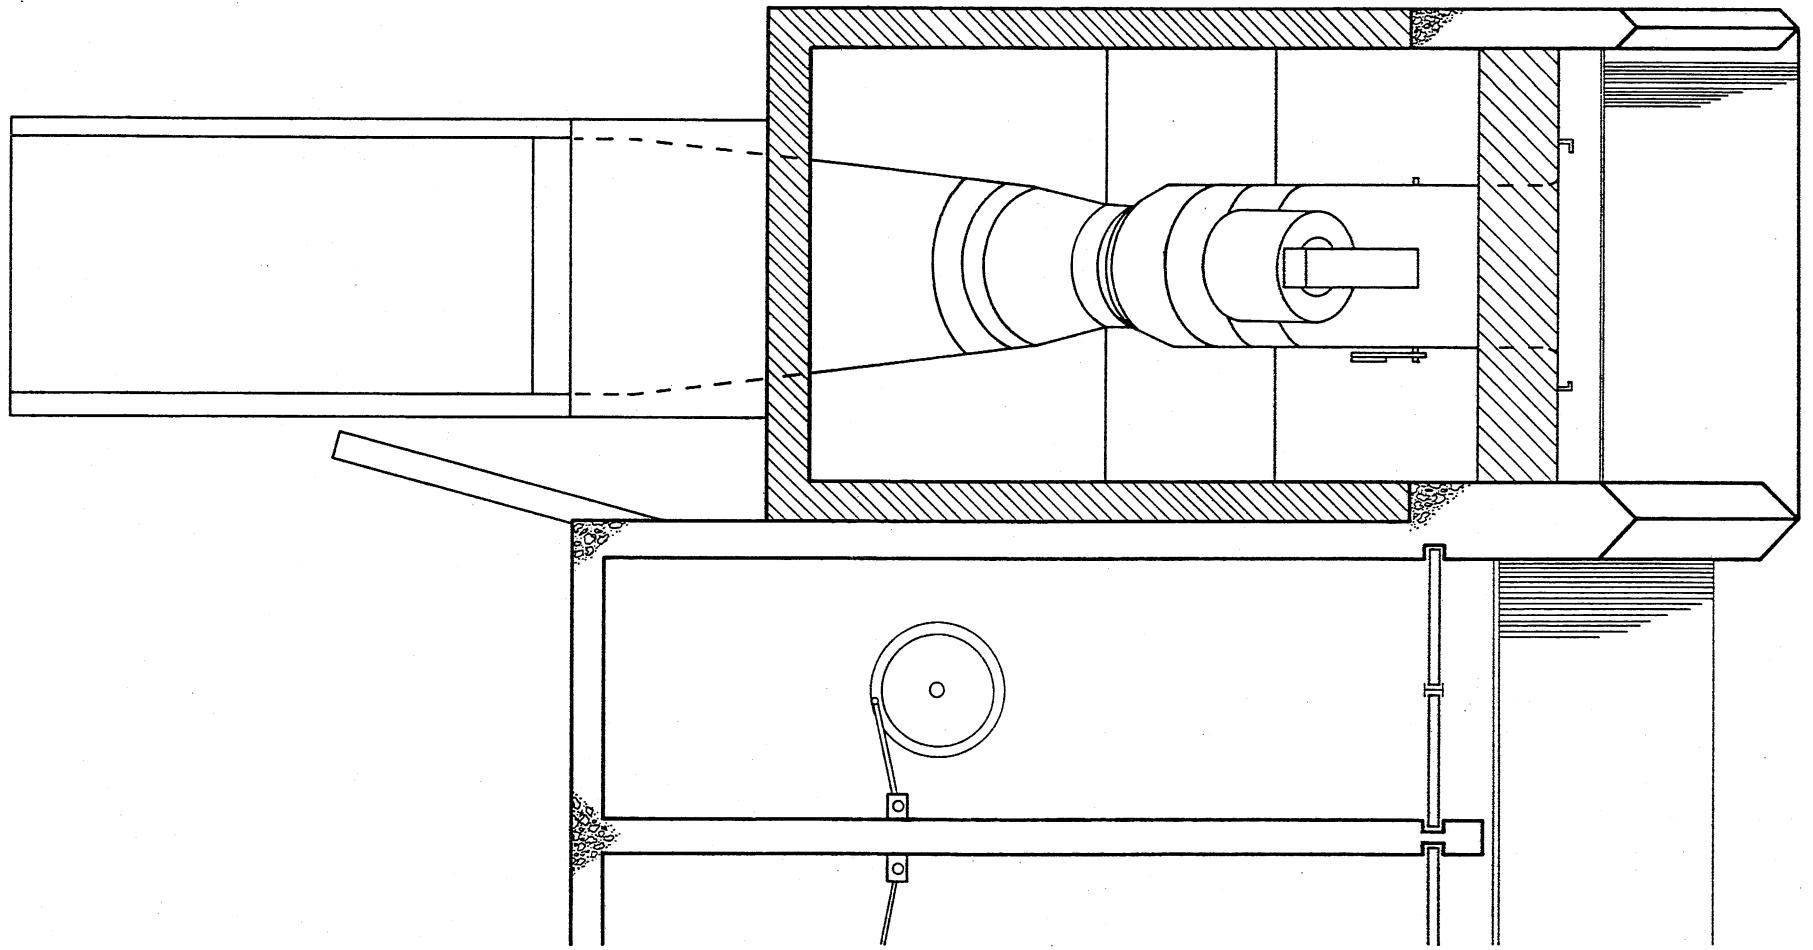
Plan View of Alternative E: Addition of One 72 in. Inclined Unit.
